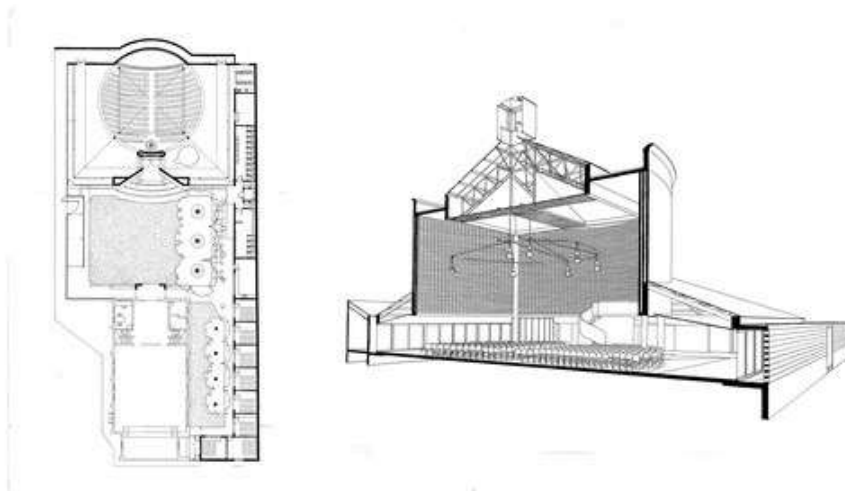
Ground floor plan and sectional view of Christ Church Somerset West.
